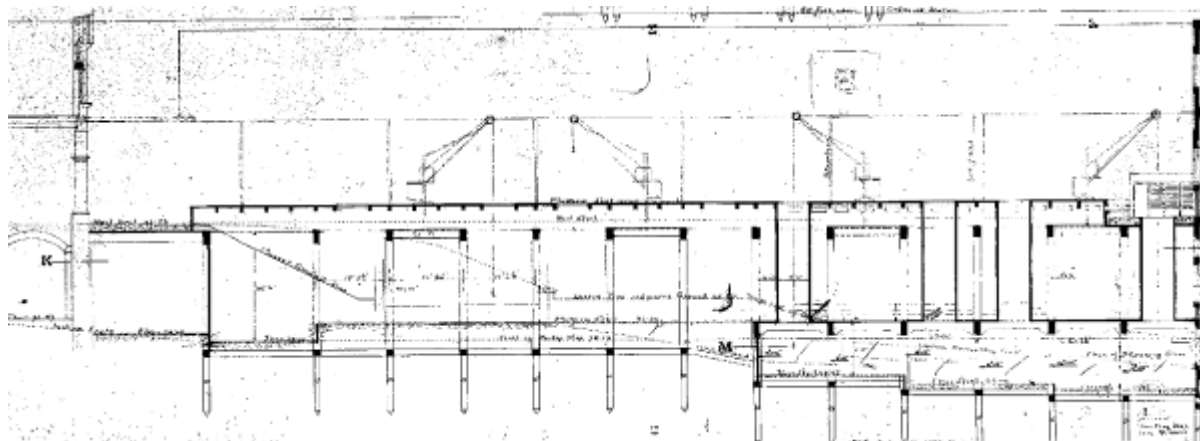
Longitudinal section through the warehouse building, showing cranes on the platform on the upper floor lowering goods down through the hatches to platform on the lower floor, NER 1907, drawing no. 16
